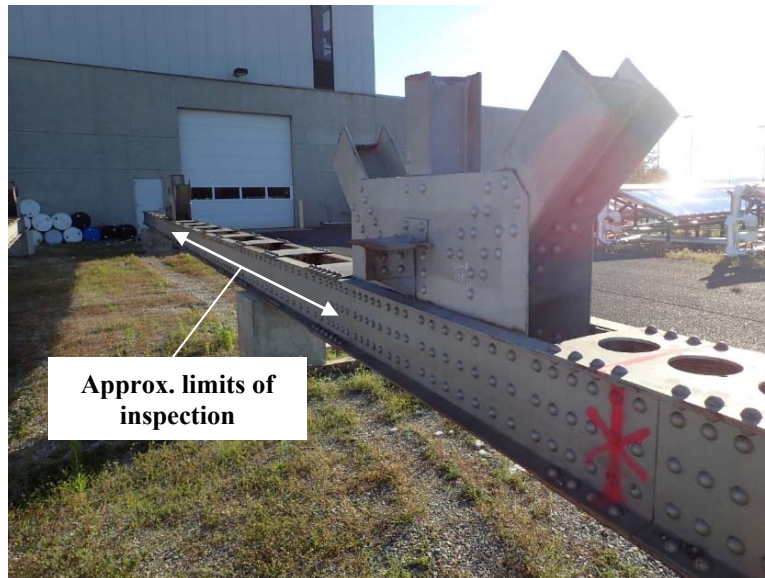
Truss chord elevation view (looking from joint L4 to L2)
